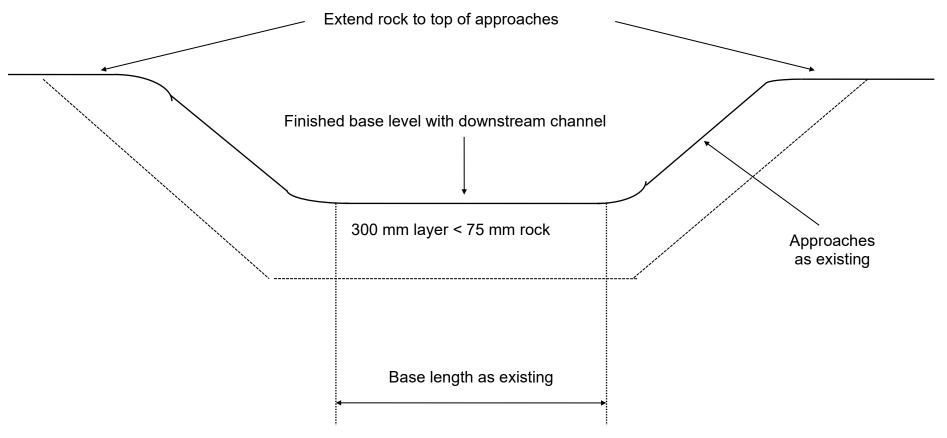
8-3 1.1 FLOODWAY DESIGN - SIDE VIEW - (not to scale)
